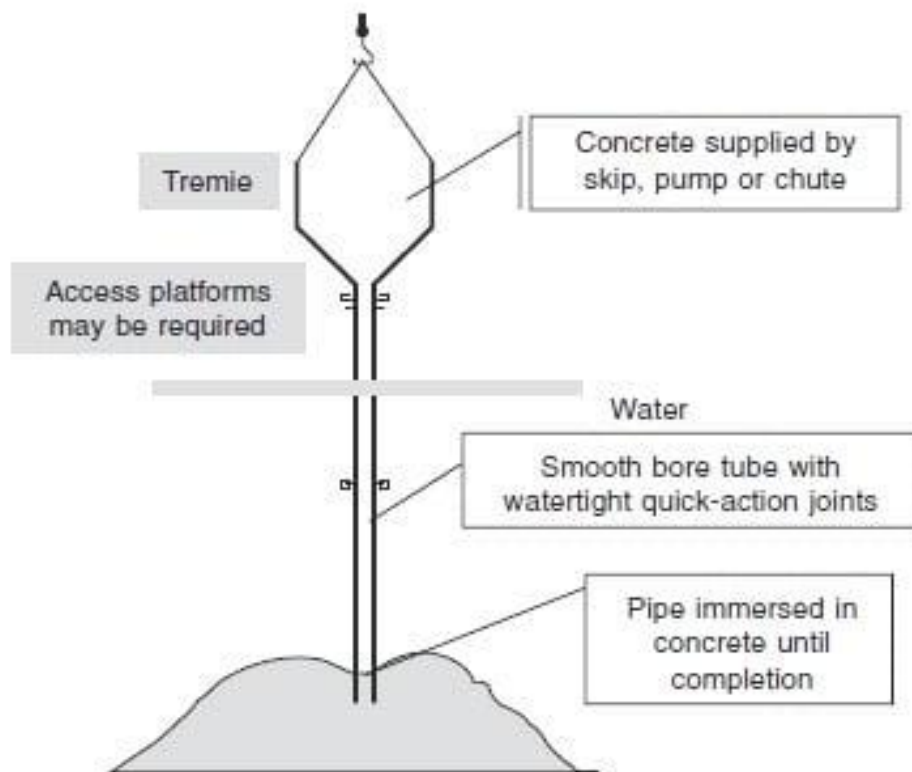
Typical Arrangement of Tremie Method of Underwater Concreting
